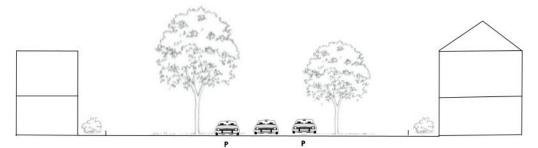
Section from avenue 9 in Quinta Camacho.
